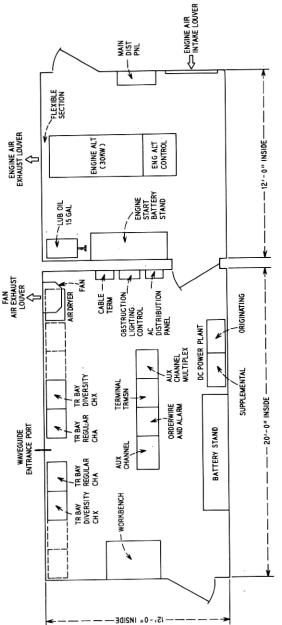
Standard floor plan layout for a TH-3 repeater station in a small building.
